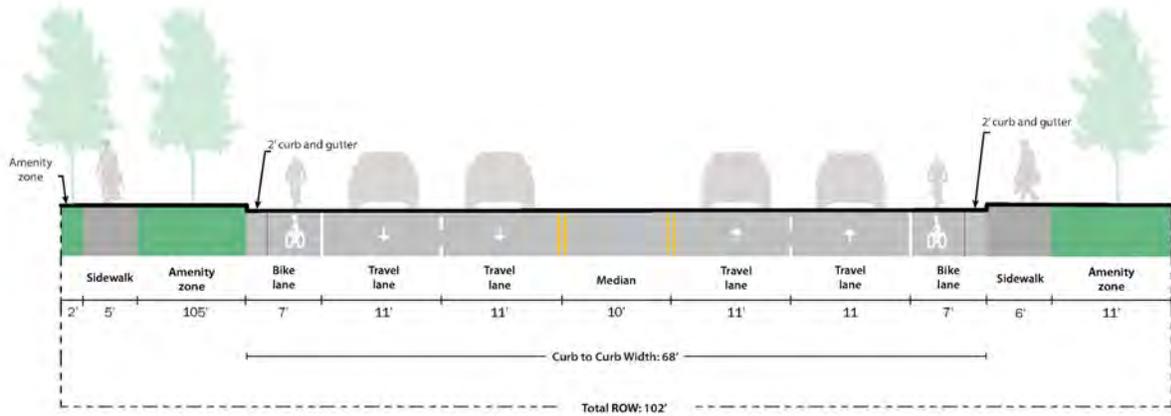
Section B (72nd Avenue West of Eaton Street – Looking East)
